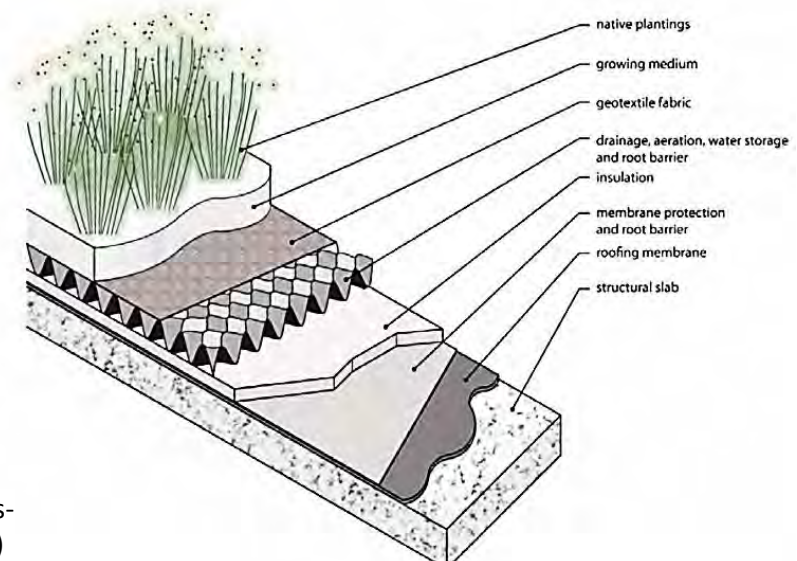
Typical Green Roof Cross-section (Source: City of Chicago, 2014)
